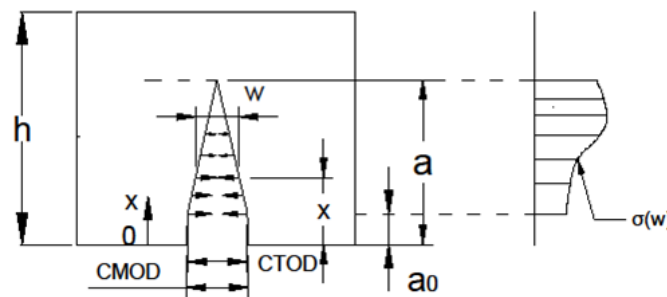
Tensile stress of fibres at cracked section of SFRC beam
